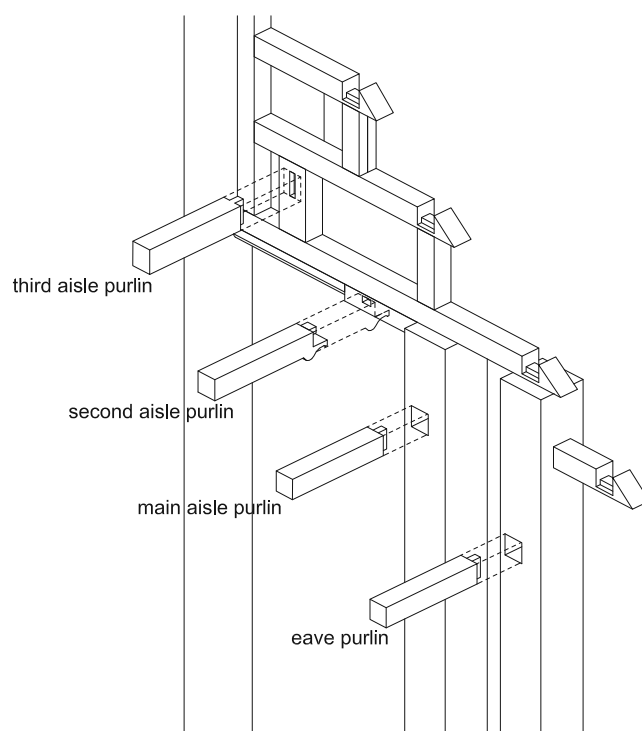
Purlins from the second bay meeting the third transverse frame in aisle roof
